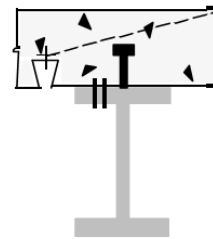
Typical rigid connectors with anchorage device to hold down the concrete slab against uplift
